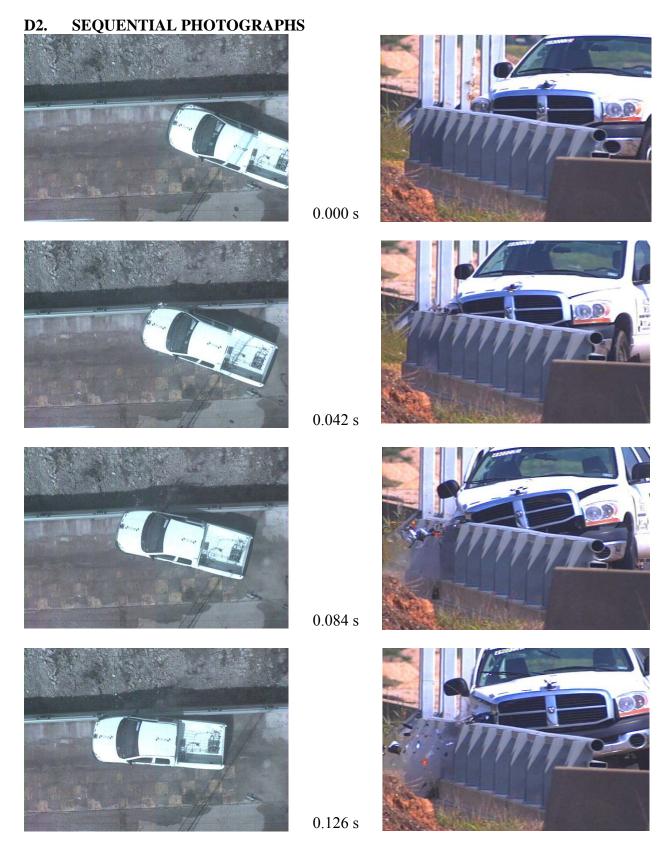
Sequential Photographs for Test No. 490022-3 (Overhead and Frontal Views).
